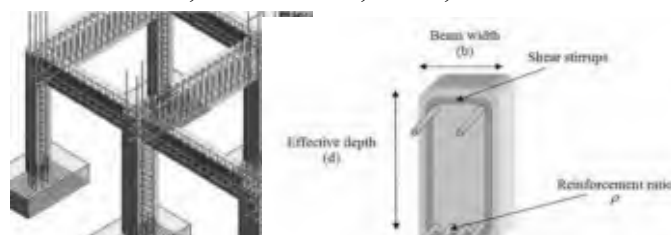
Reinforcement Beams: Source (The Constructor, 2009)
